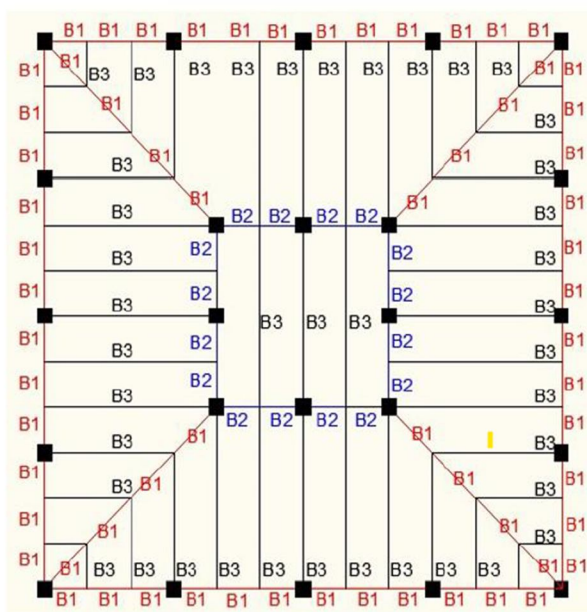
Typical Floor Plan of Diagrid Steel Structure
